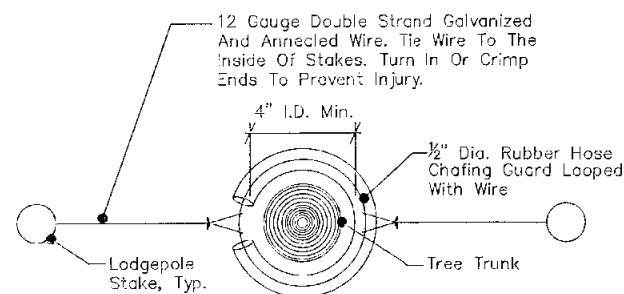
City of Scottsdale Standard Details Salvaged Tree Planting
